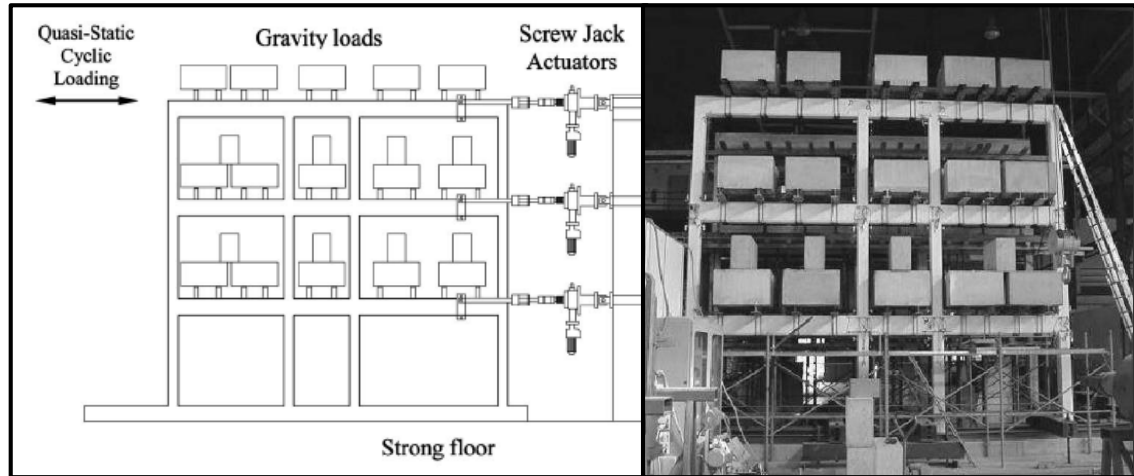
2/3 scale, 3-storey, 3-bay plane RC frame tested under uni-directional quasi-static loading (from Calvi et al. 2002b).
